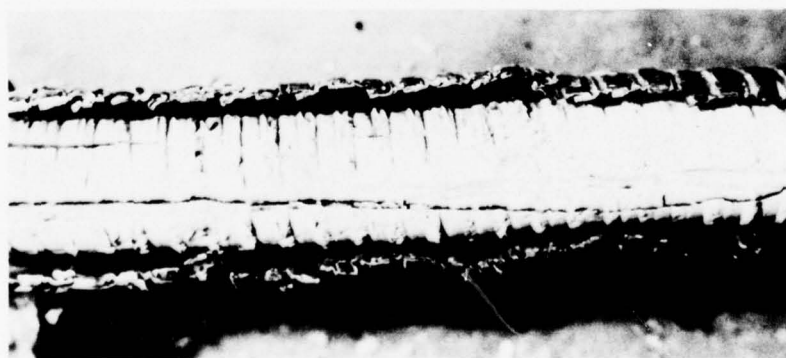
Grout at the seaward end in beam 15 just after conduit was opened. Note longitudinal crack, relieving the remaining stress in the steel
